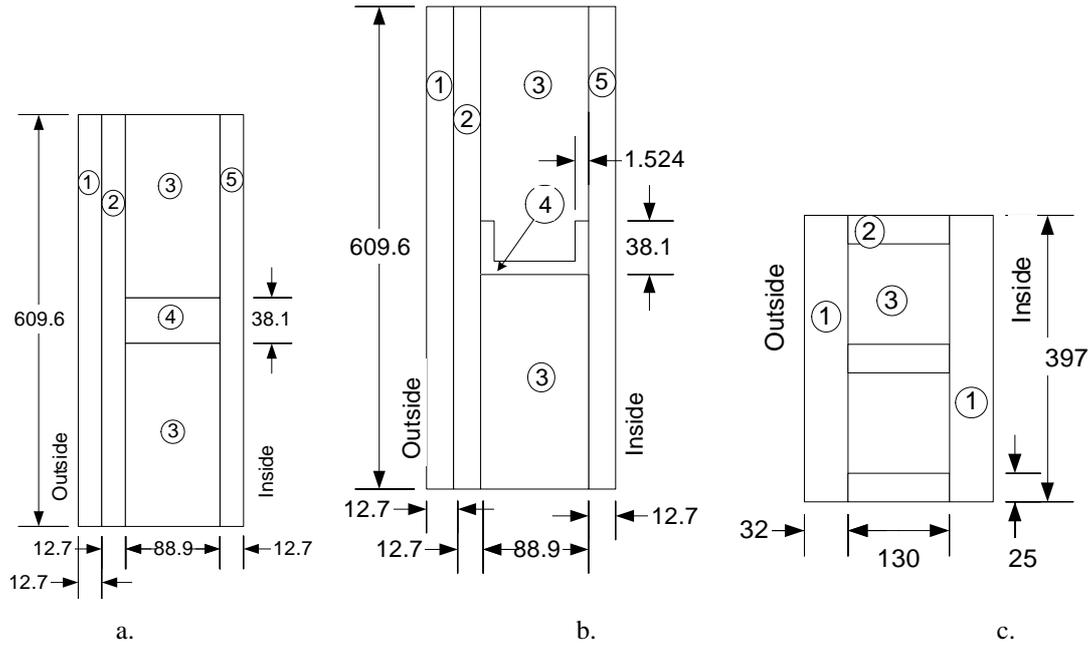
Three wall types: a) wood stud; b) metal stud; c) concrete block. All dimensions in mm.
